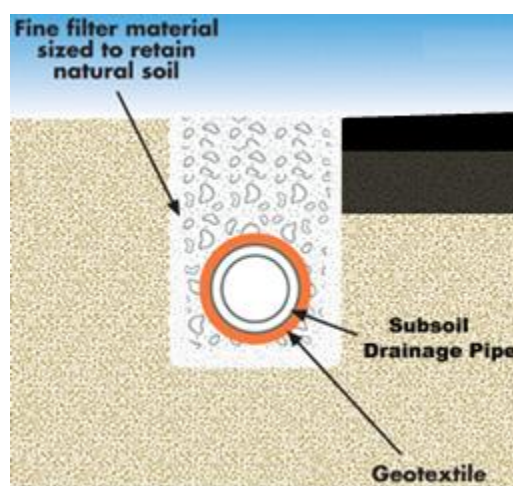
Schematic cross section of the longitudinal drainage system (on wall side)
